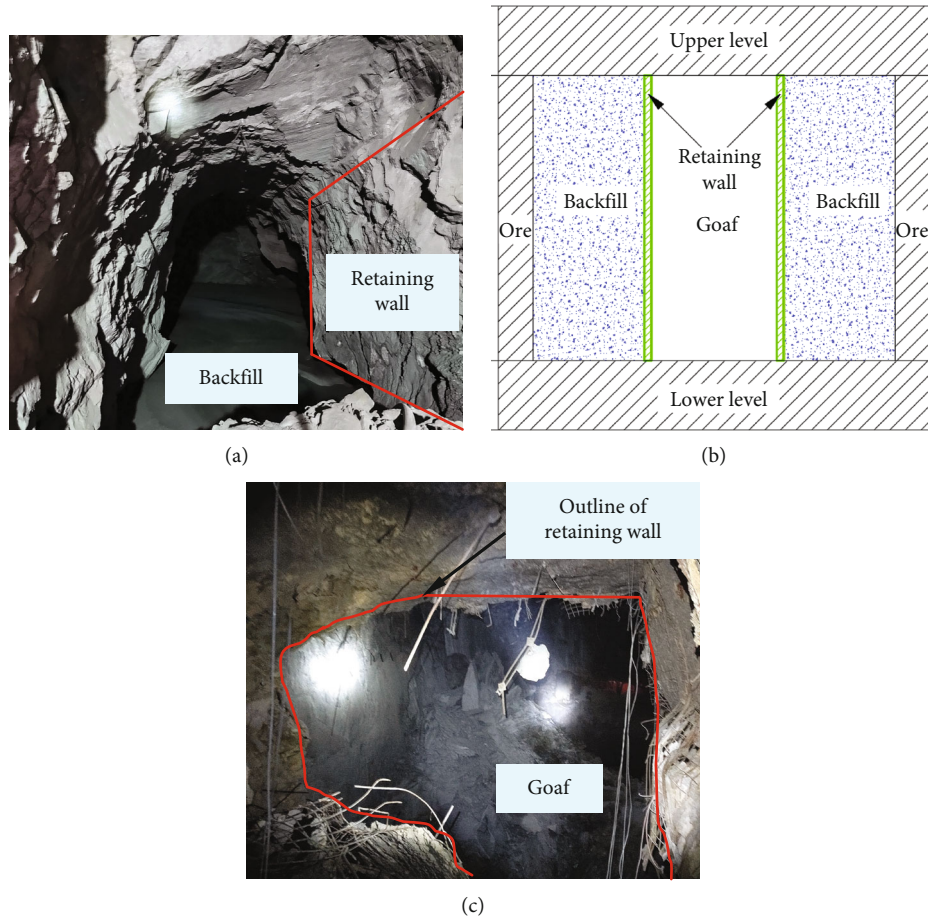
Position of retaining wall, goaf, and backfill: (a) intact retaining wall, (b) the spatial position of retaining wall, and (c) collapsed retaining wall.
